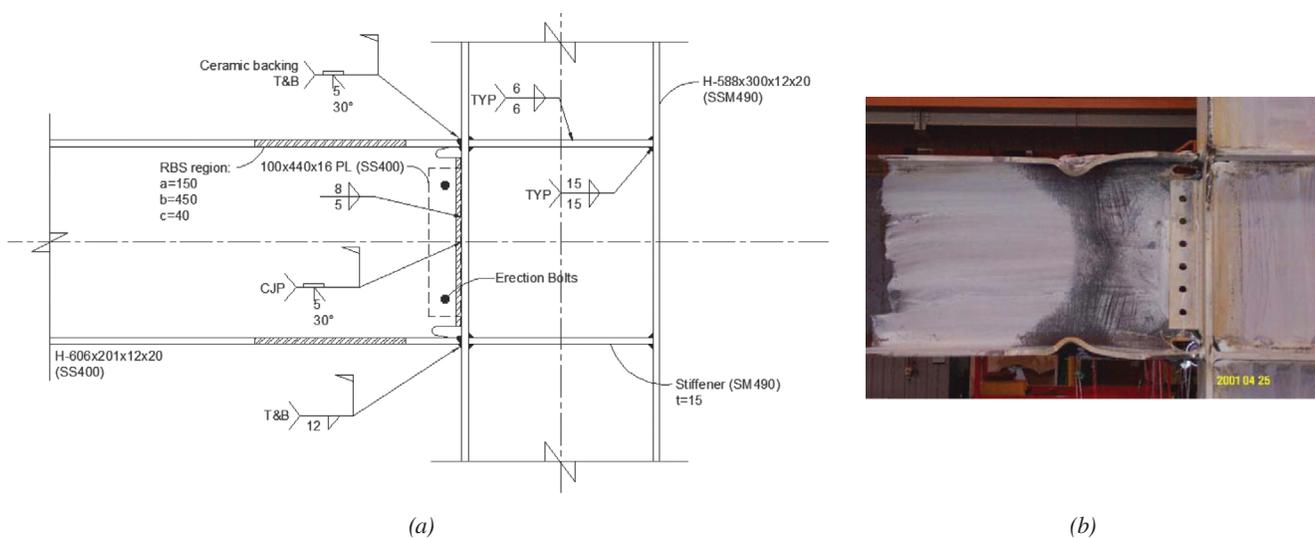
RBS moment connection with fillet-welded continuity plates: (a) connection details (in millimeters); (b) yielding pattern and deformed configuration (Lee et al., 2005).
